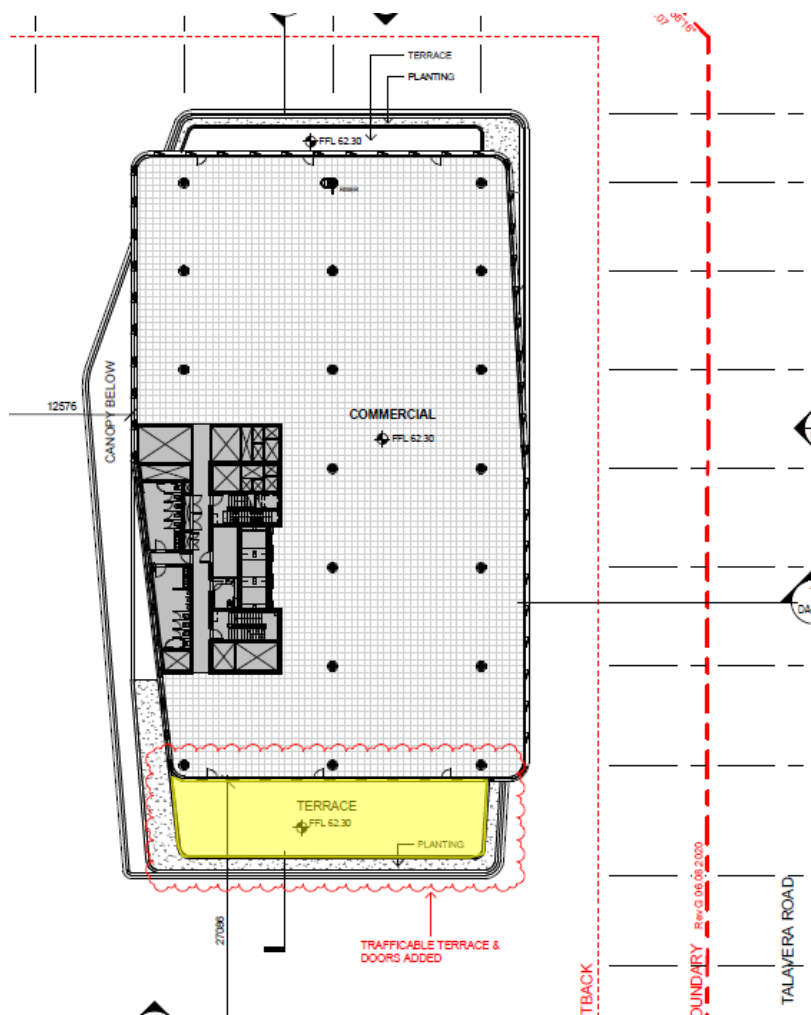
Extract of Level 1 floor plan of Building C, showing terrace at the rear of the building (shaded in yellow)
